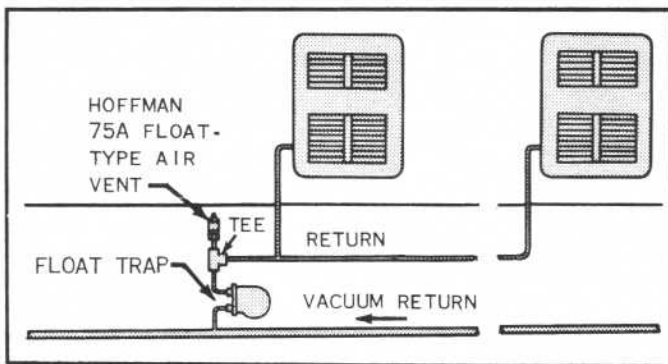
Piping Details for Connections to Existing Vacuum Return System
